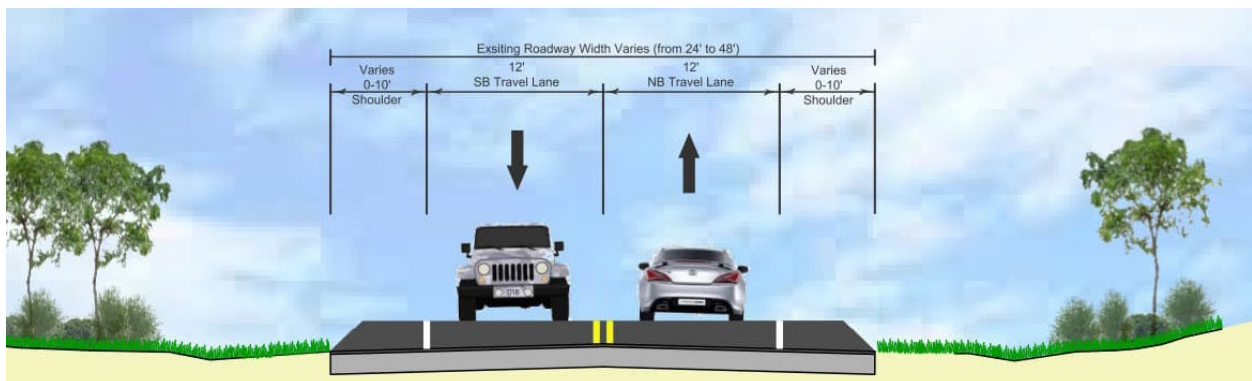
Existing Typical Section MD 272 Lums Road to Nazarene Camp Road
